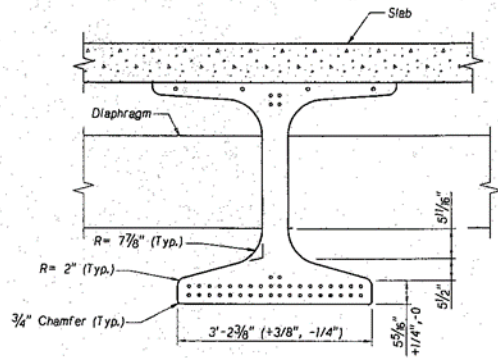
Girder reinforcement and strand distribution, from the construction documents of Scottsbluff Gering Bypass Bridge, courtesy of NDOT
